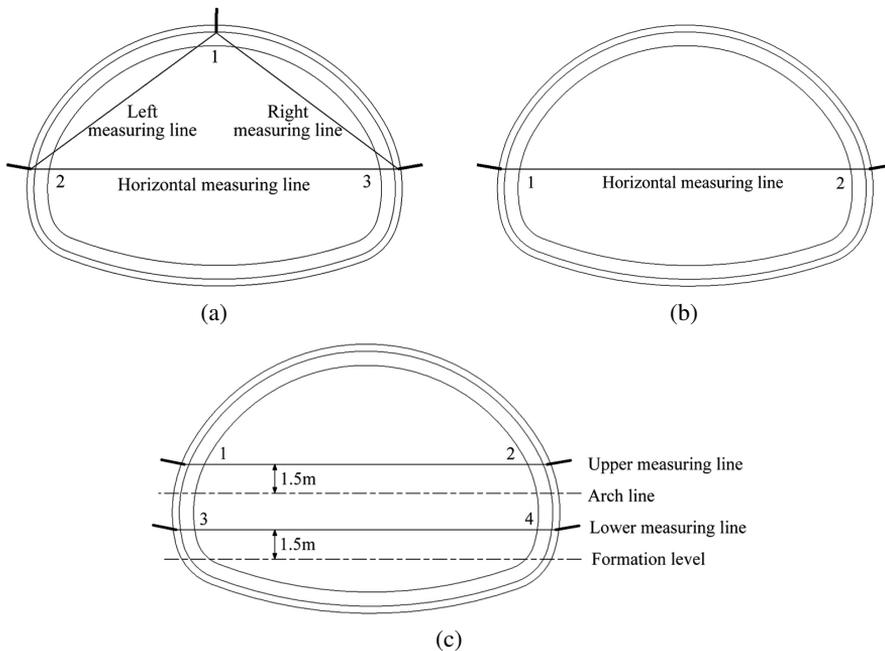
Displacement measurement line layout around the section: a) K0+546 Section, b) K0+856 Section, c) K1+134 Section
